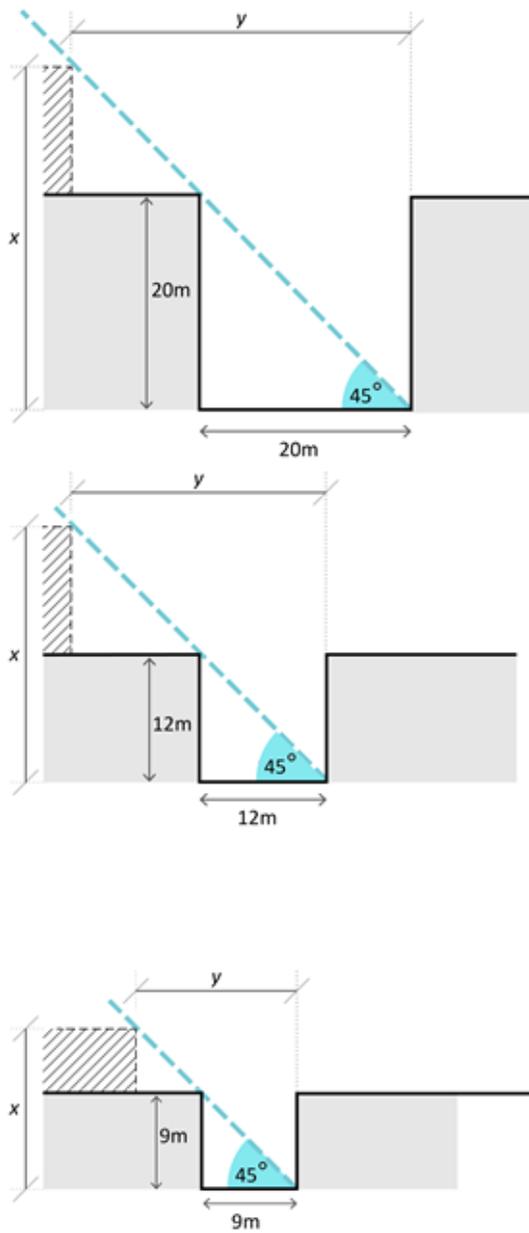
The maximum allowable building height is in part determined by the width of the road reserve. Building height may also be limited by other built form principles and design requirements outlined in this document.
